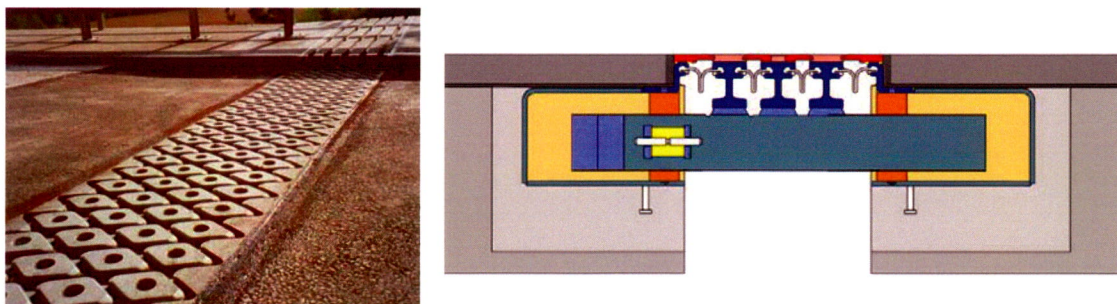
Left: An installed XL expansion joint; Right: cross sectional view of a crossbeam.
